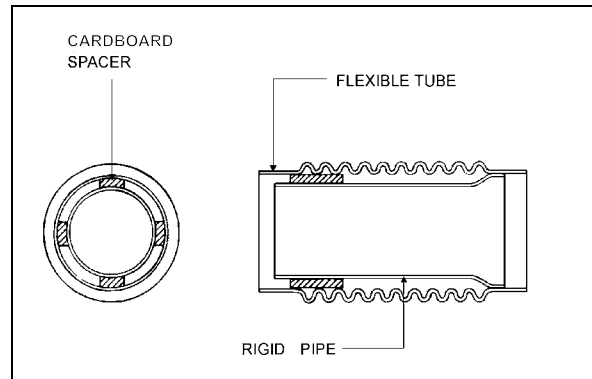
FLEXIBLE TUBE INSTALLATION
